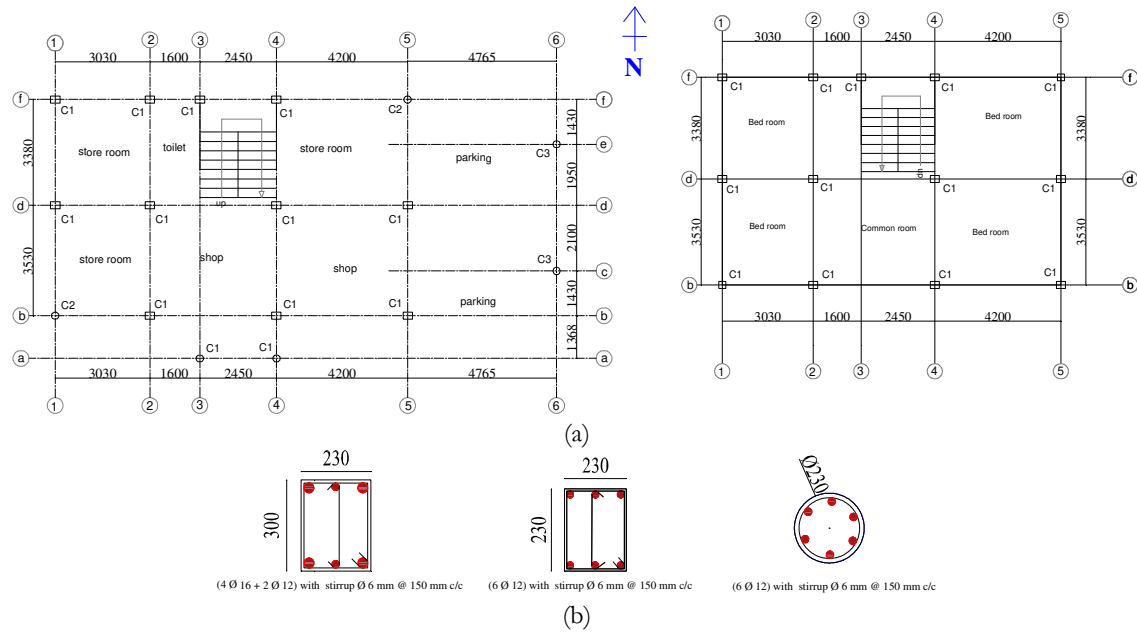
Geometrical details and structural layout of the MRT1 building; (a) Plan and structural layout of the first and top floors, respectively, and (b) Detailing of column sizes and reinforcement (all dimensions are in mm)
